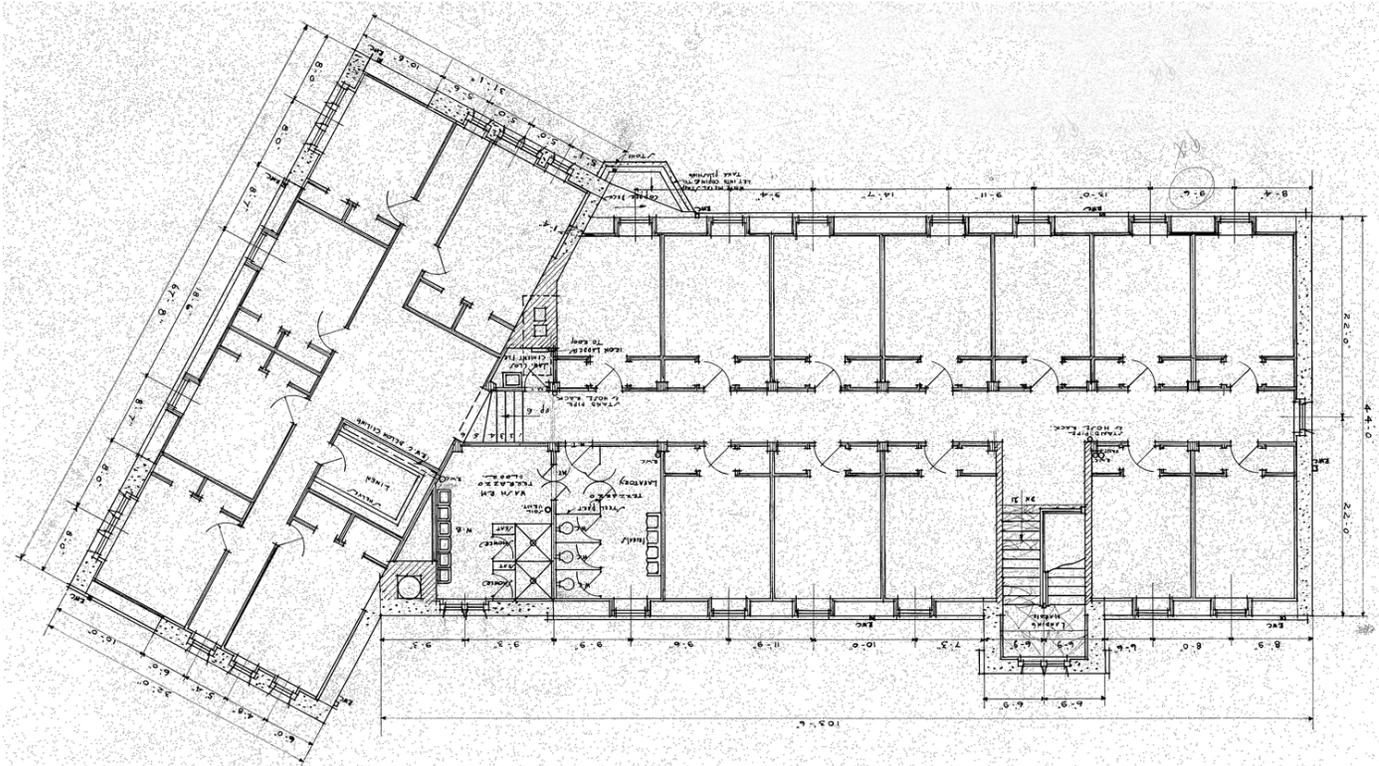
Attic plan of 1922 wing of St. Andrew's College. Retrieved from Facilities Management Division Asset Record System, File SC-14-T.
